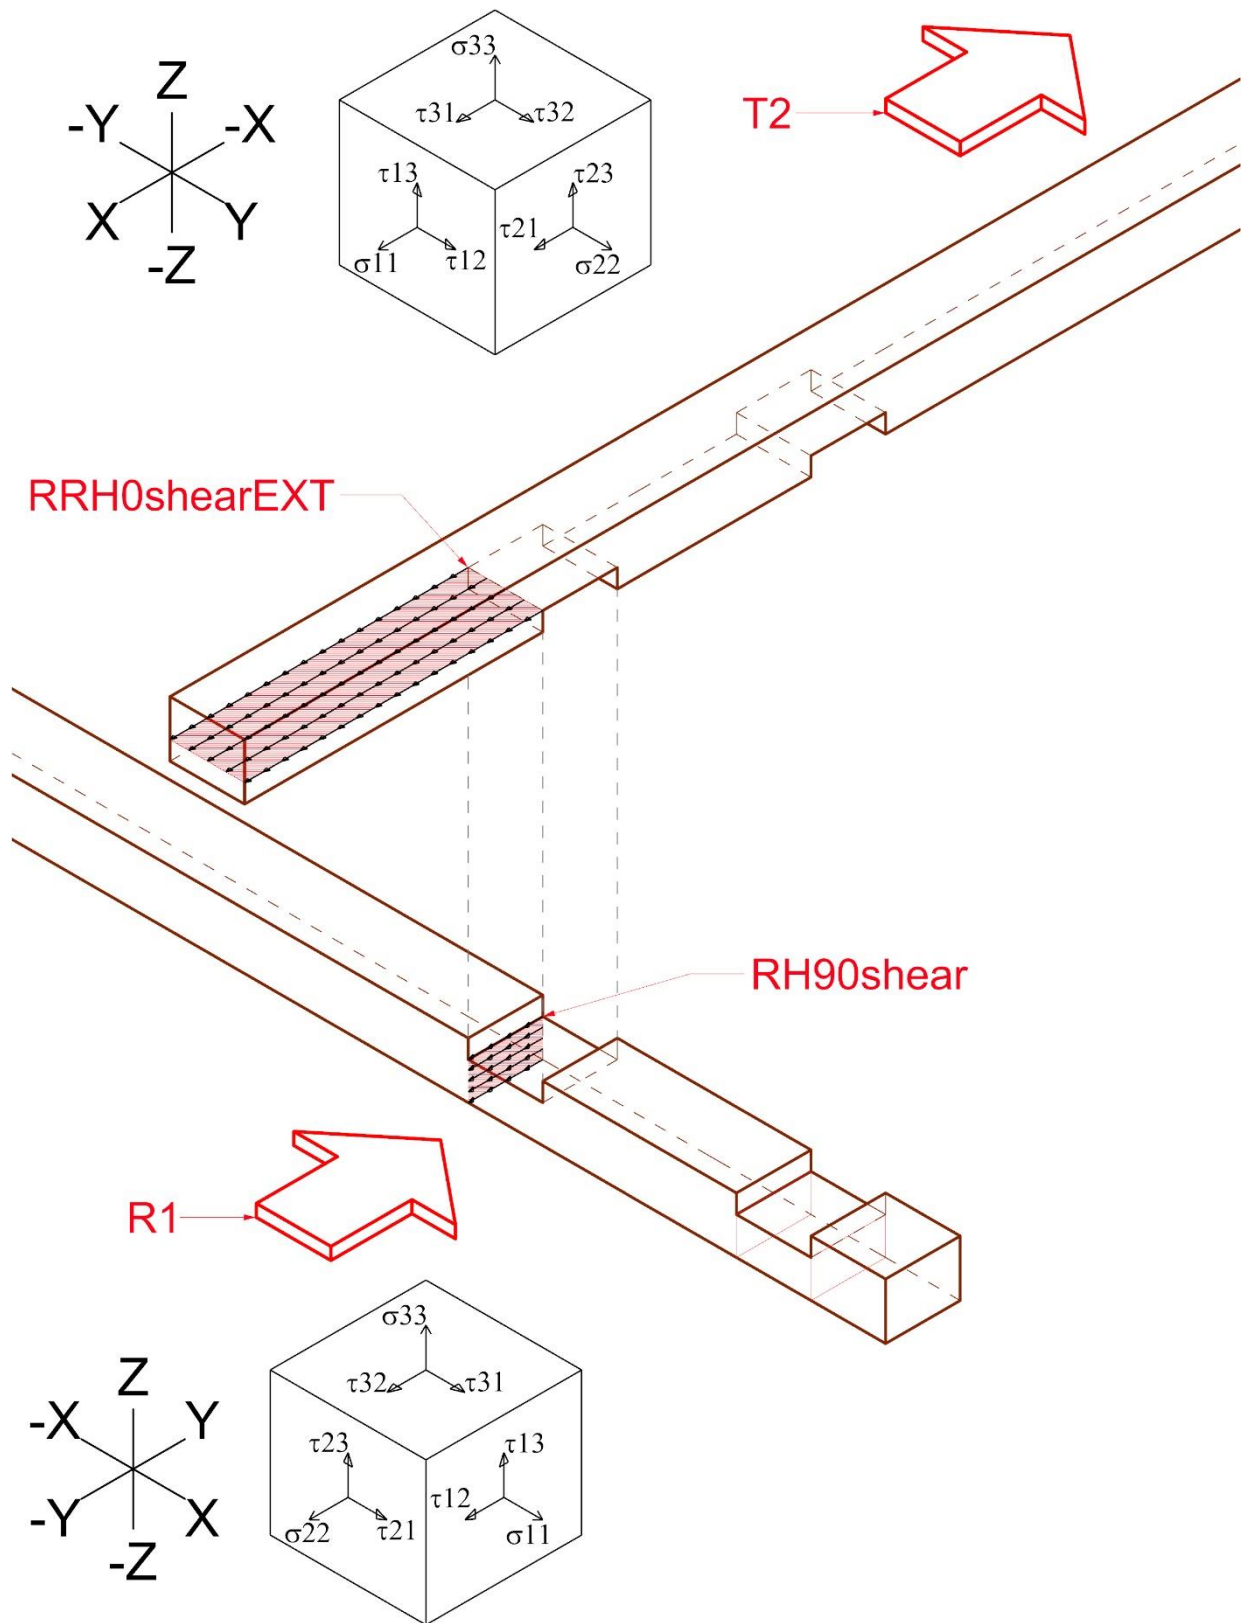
Roof Rafter Head Tangential stresses: Crossing rafters T2-R1
